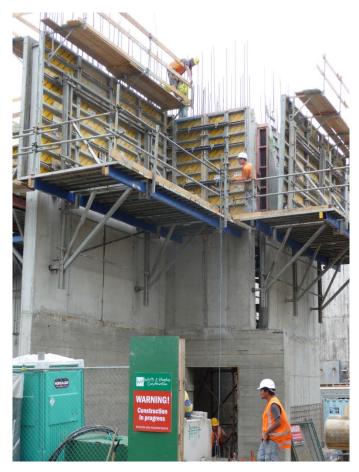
During both design and construction these reinforced concrete walls were checked by engineers to ensure the structural design was sound and that construction was in accordance with the plans.
